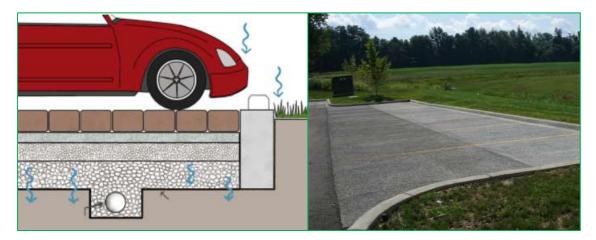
TYPICAL INTERLOCKING PERVIOUS PAVER SECTION VIEW (LEFT) AND A PERVIOUS PAVEMENT FACILITY (RIGHT)
